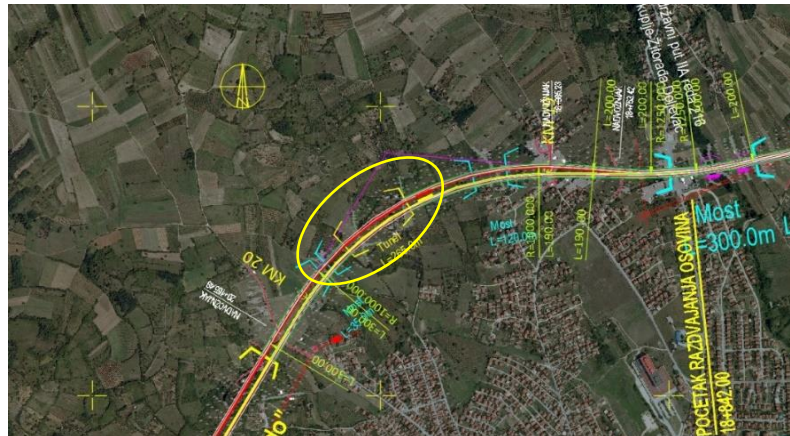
Tunnel 6 “Plehane kuće” proposed layout
